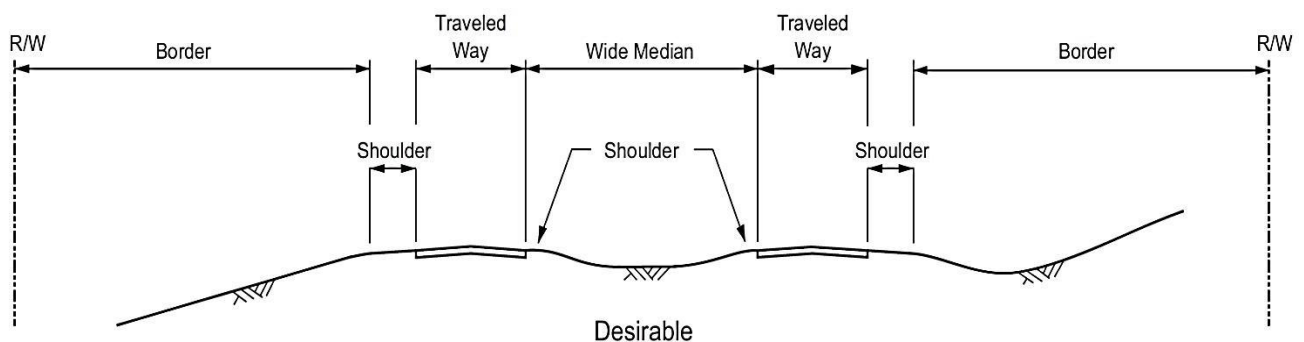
/3: Cross Sectional Arrangement on Divided Arterials [1, p.7-21]
